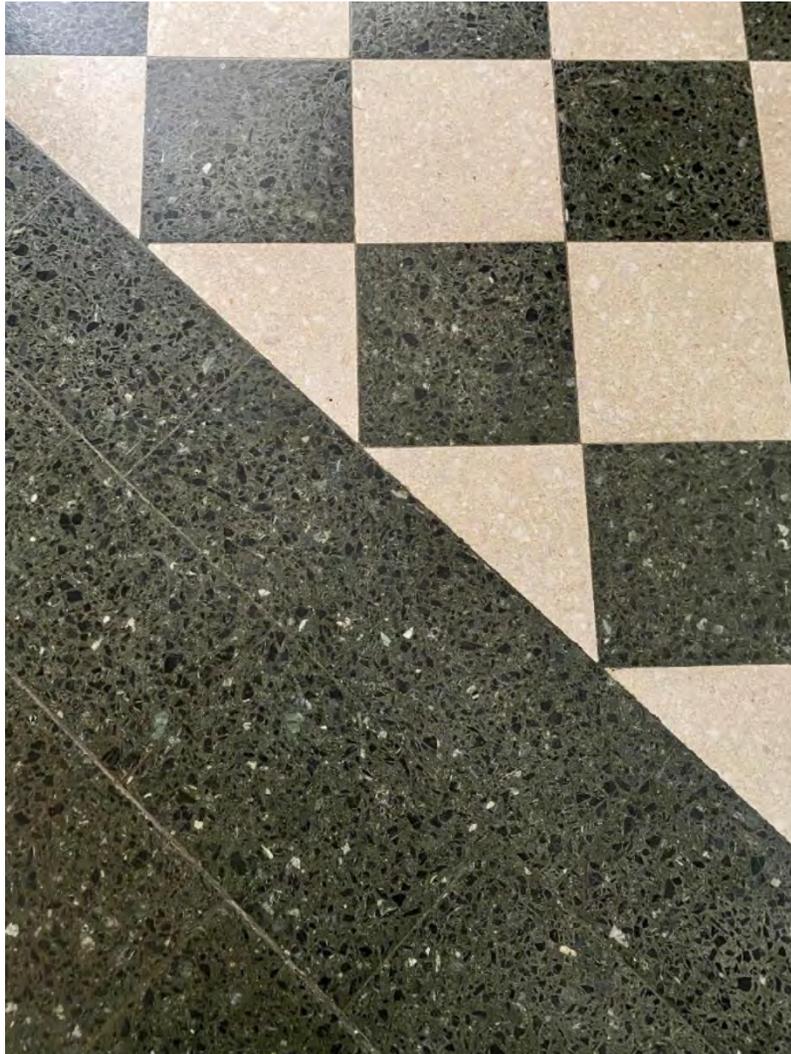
Staircase and terrazzo floor, photo by Patricia Rouse.
